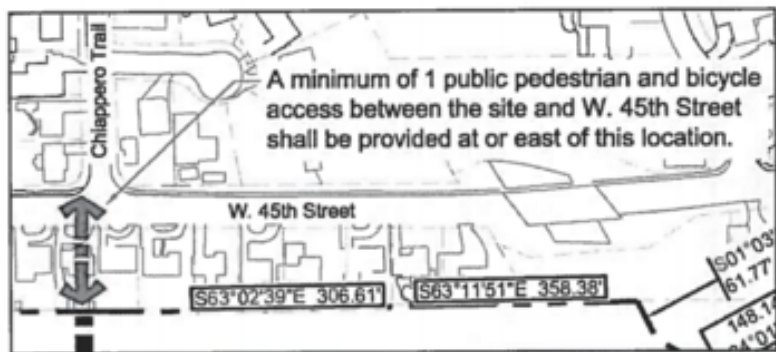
Portion of Roadway Framework Plan, dated 11/12/15
